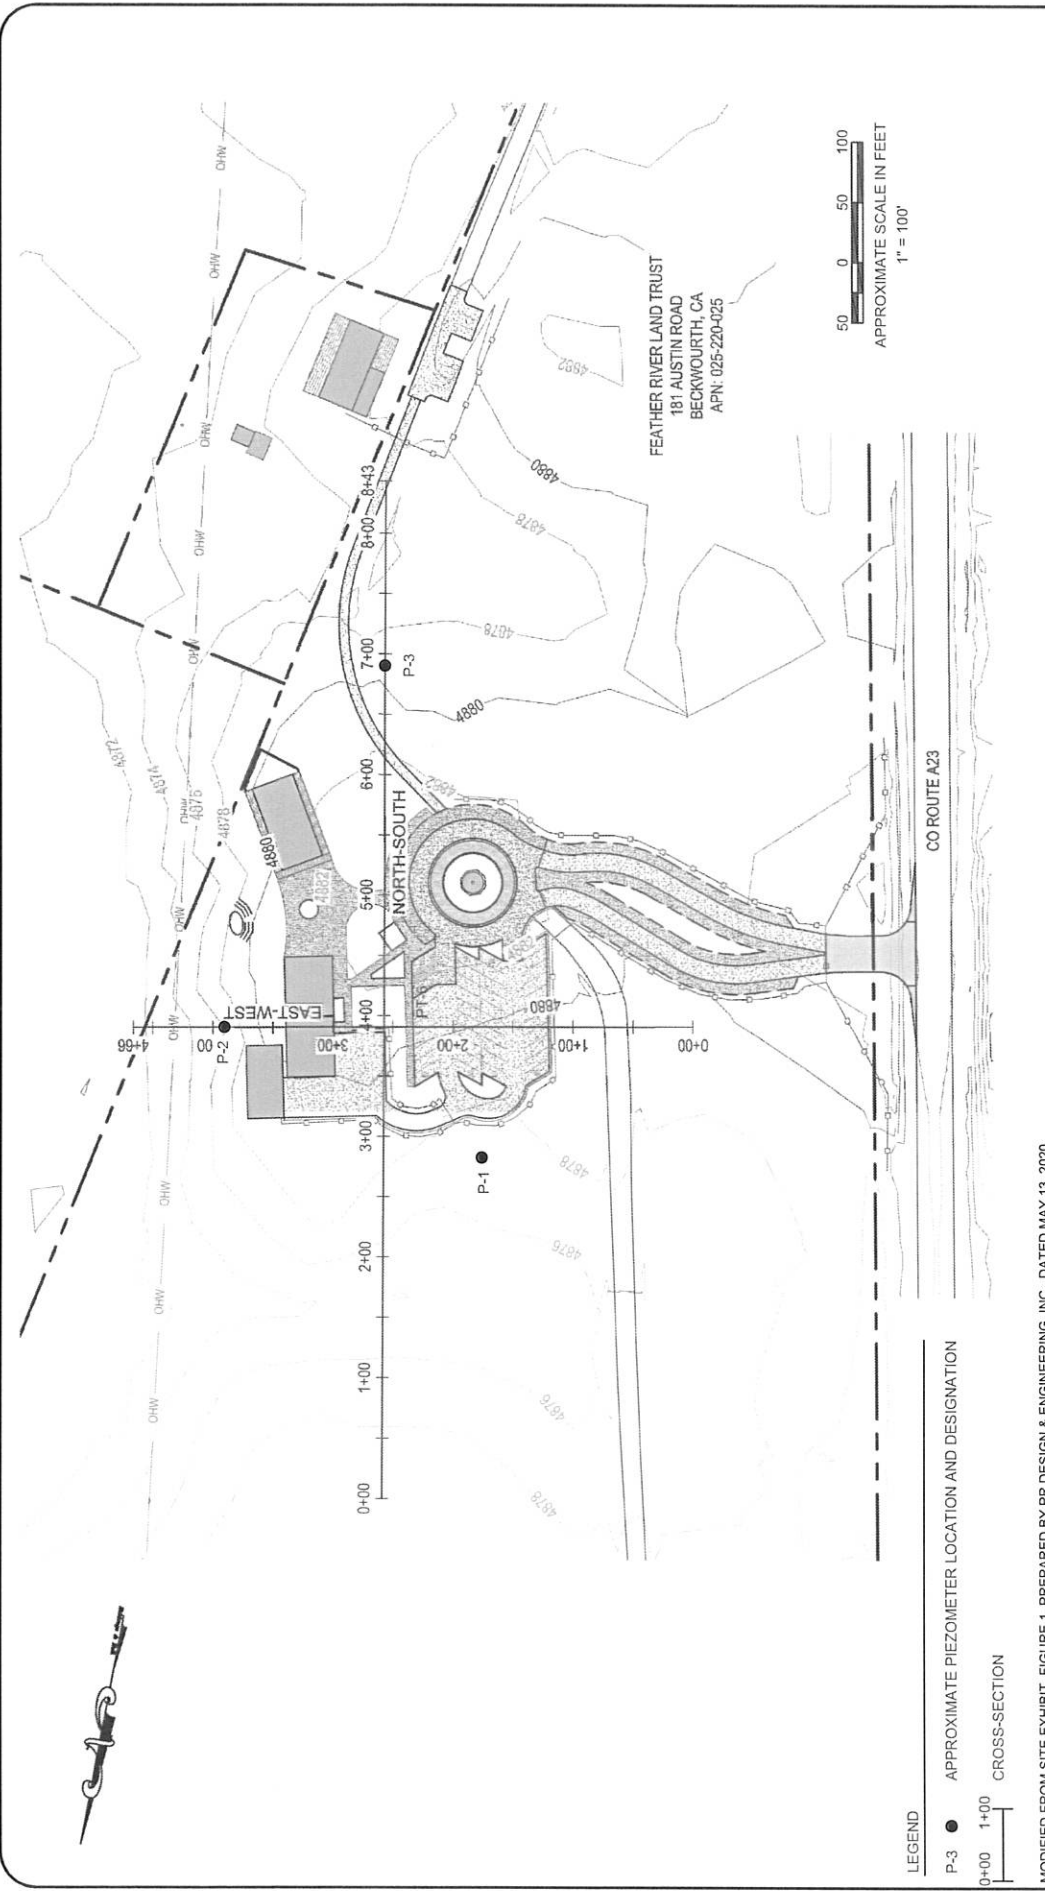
Test Pit, Piezometer, and Percolation Test Location Plan
